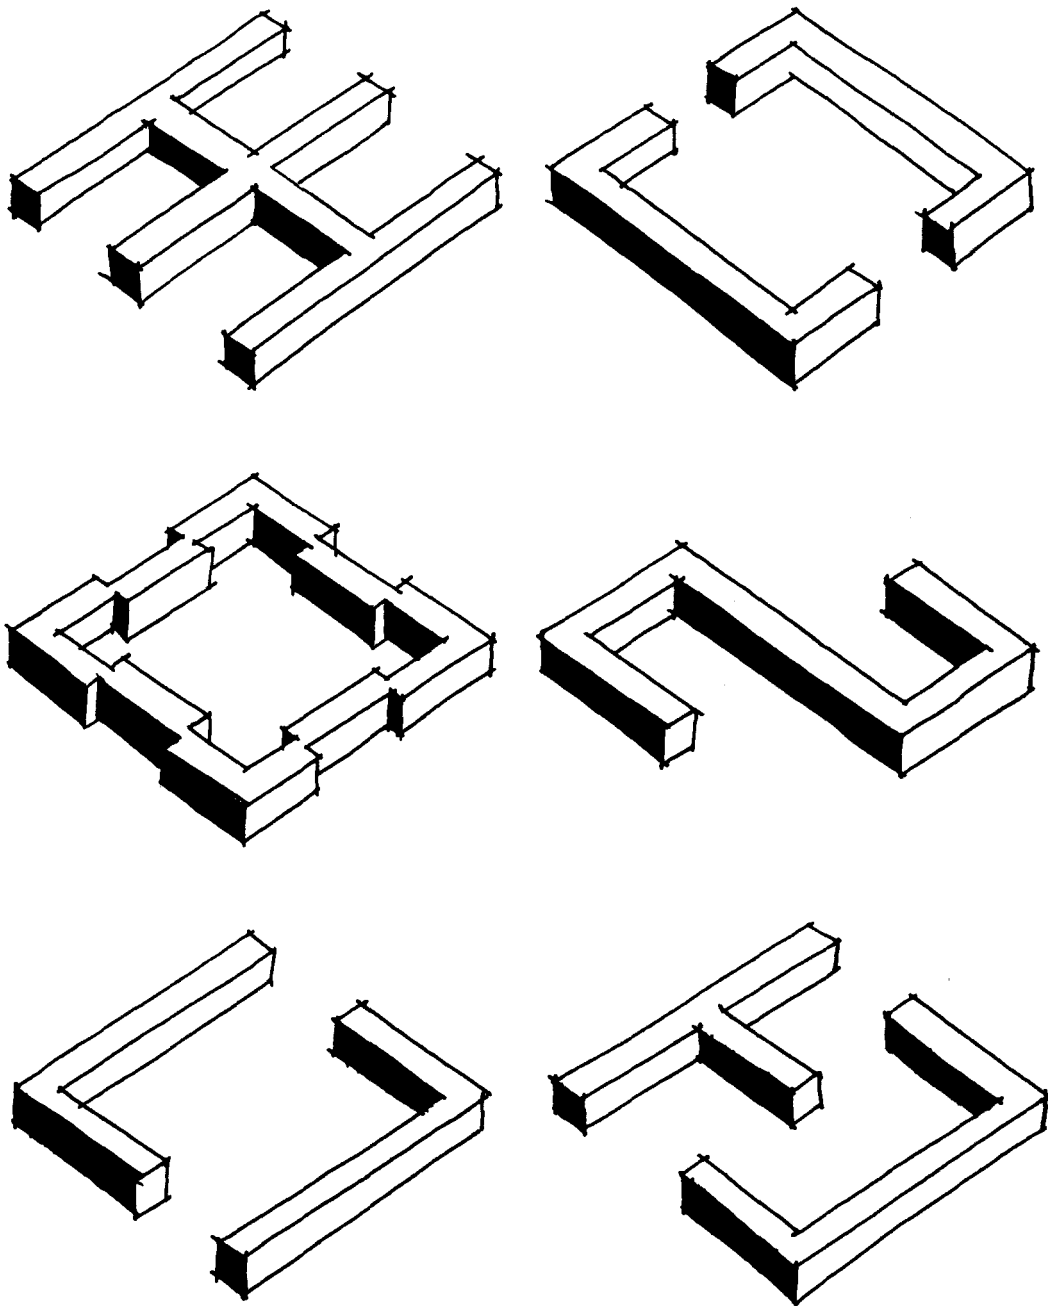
Isometric view of alternative building layouts for 'perimeter development'.
